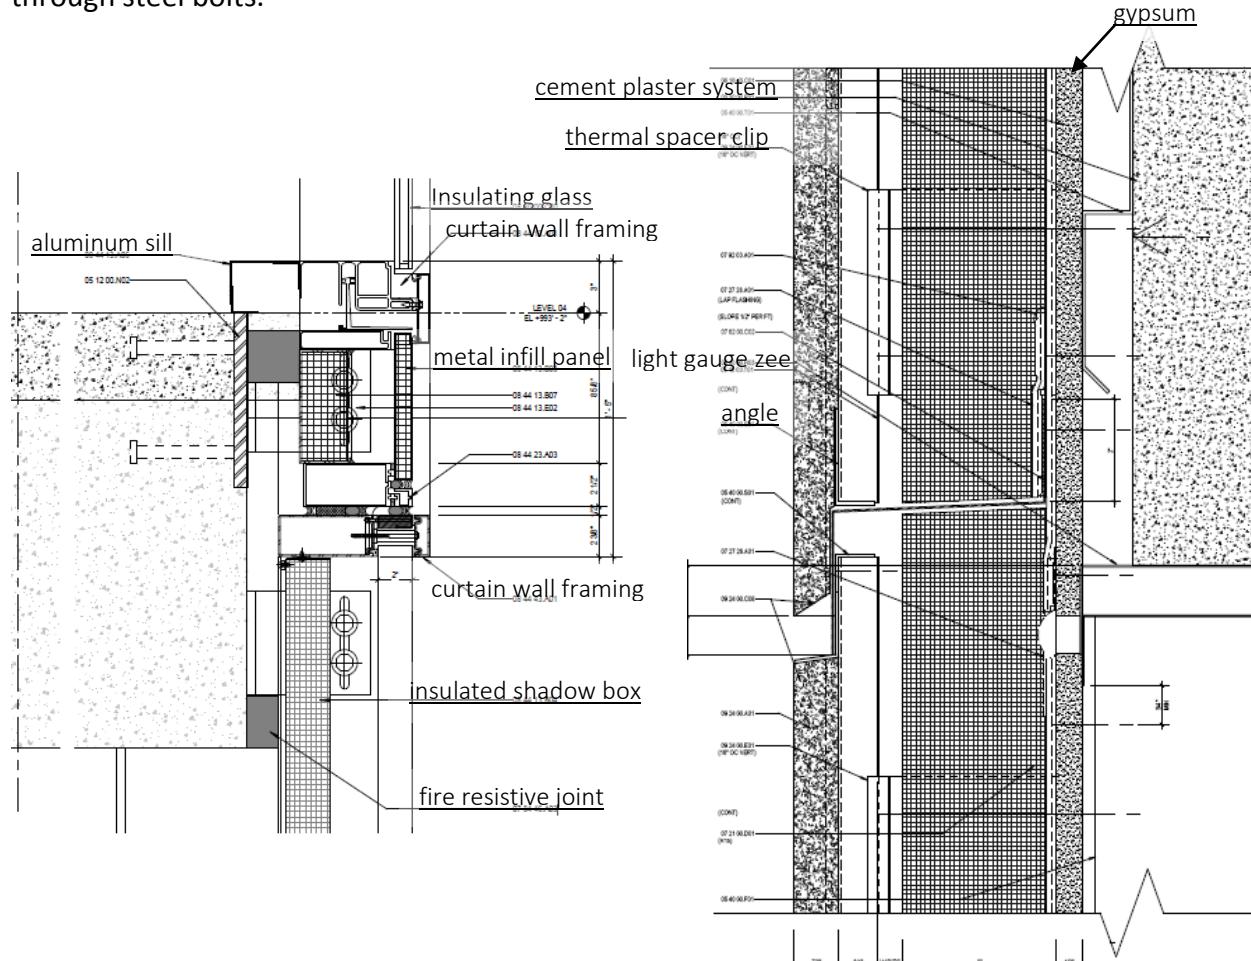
| Curtain Wall Connection Detail (left) and Stucco Panel Wall Envelope (right) from SmithGroupJJR
